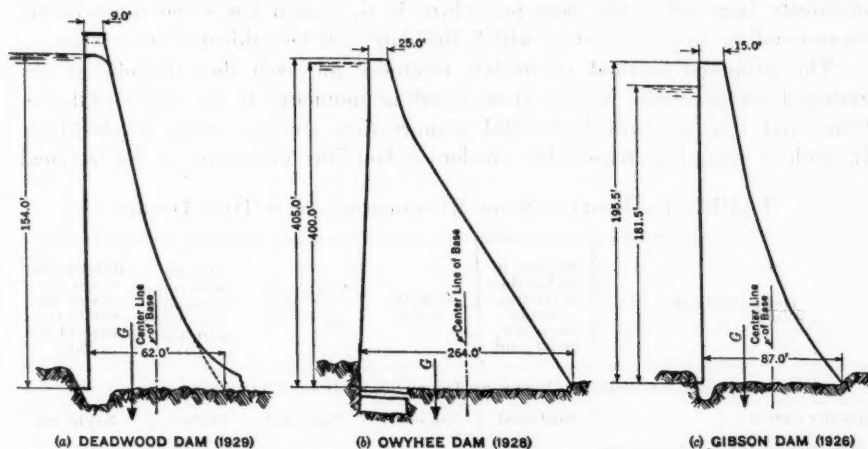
TYPICAL CROWN SECTIONS; GRAVITY ACTION CONSIDERED.
